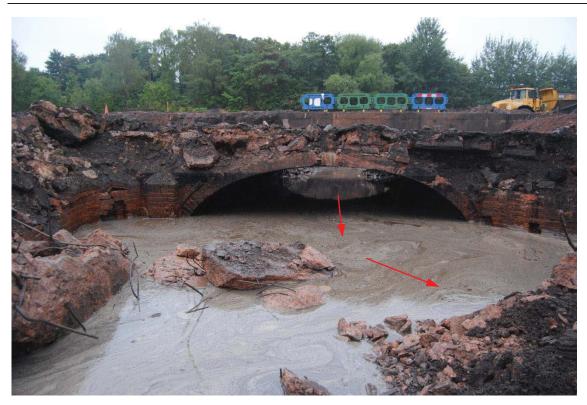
Brick culvert (1030), with retaining wall (202/1003) visible to the right. In the foreground the broken out remains of a later concrete slab extension to the culvert (1034) are visible; view southwest
